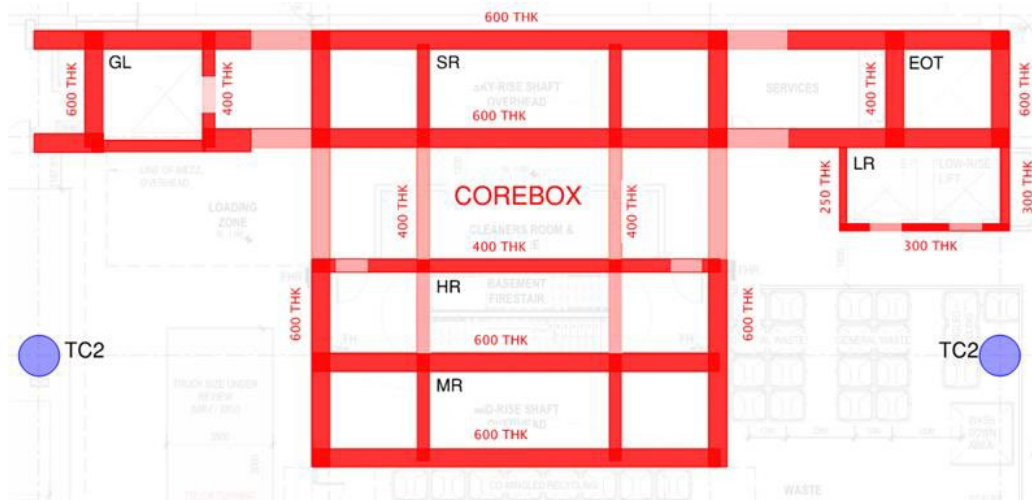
Low-rise Corebox Arrangement and Wall Thicknesses
